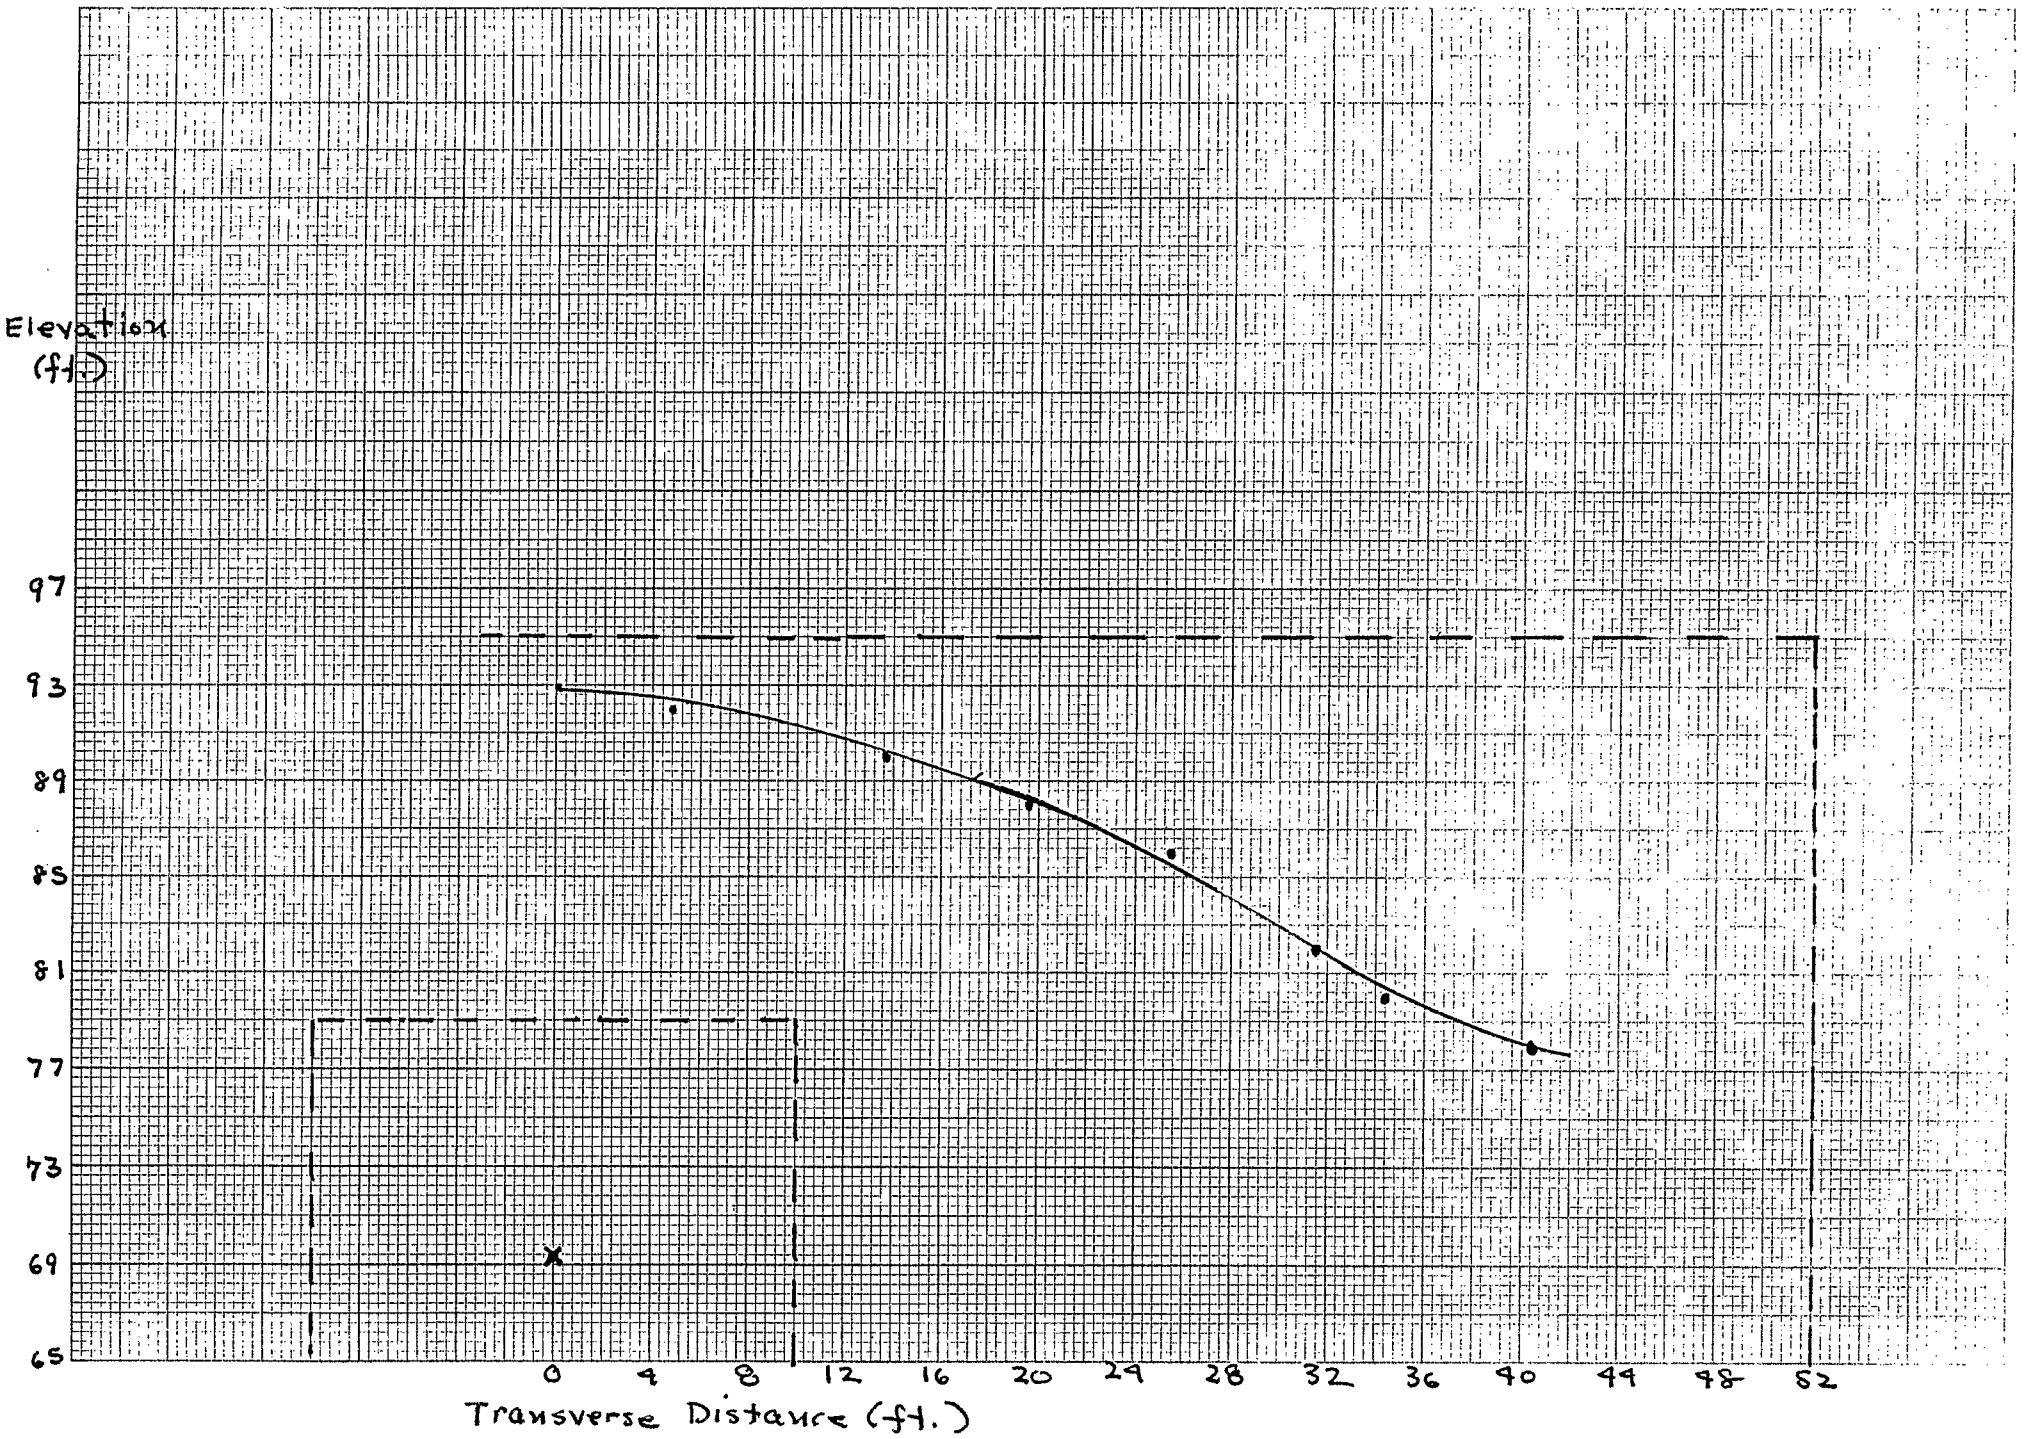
Half Cross Section of the 6 O'clock End Wall. The Berm Contour does not Reflect Recent Construction
